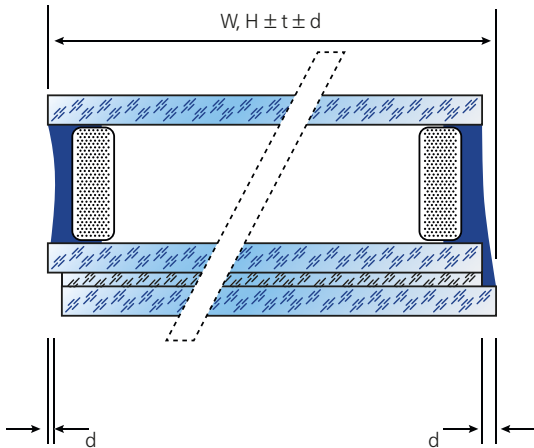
Dimensional-/misalignment tolerance in double- and triple-glazed insulating glass, rectangular panes
